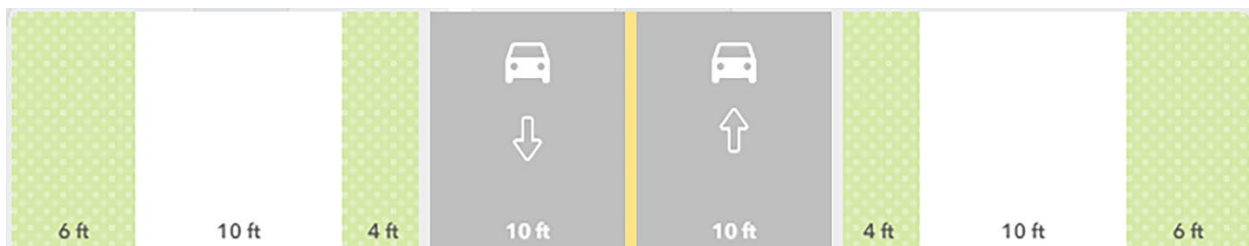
Typical Cross Section where 10-foot shared used paths are proposed (between Airline Drive and Fulton Street, in front of Burbank Middle School, and Irvington Blvd to Jensen Drive)
